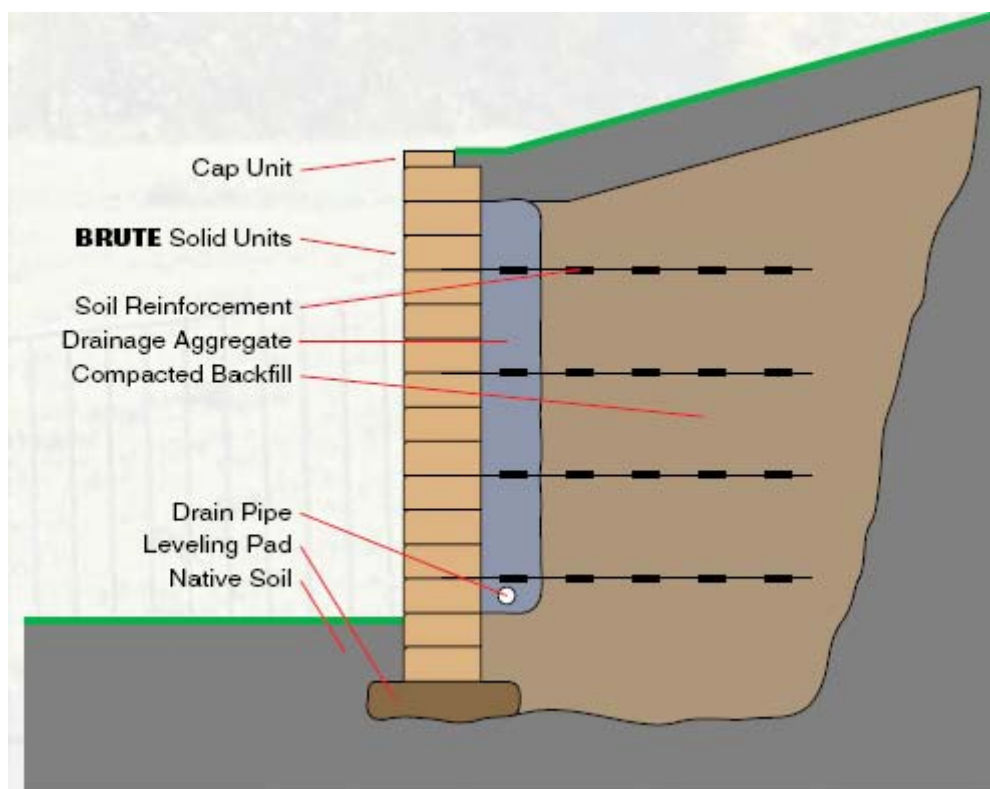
GRS-RW typical section drawing (BRUTE retaining wall system)
